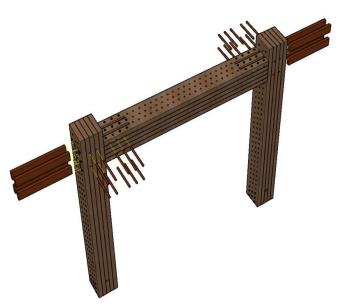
Adhesive free and non-metallic portal frame using compressed wood connectors
